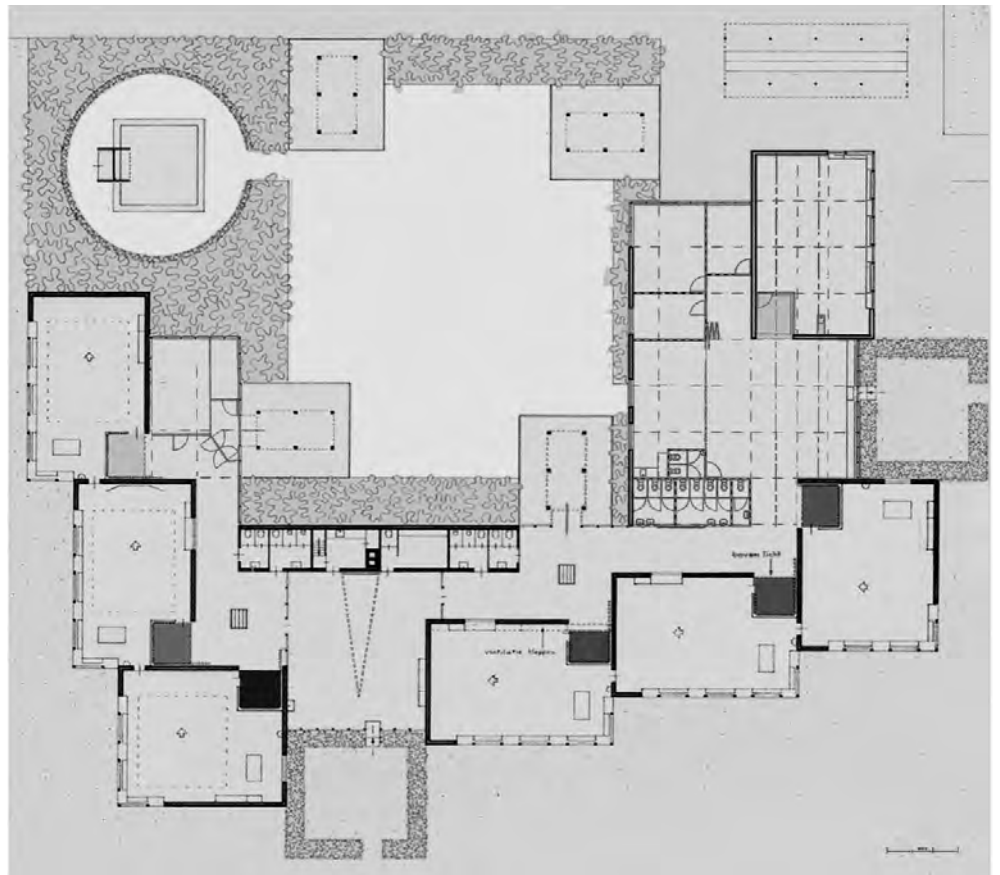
Ground plan of the school by A. van Eyck, 1954-56
